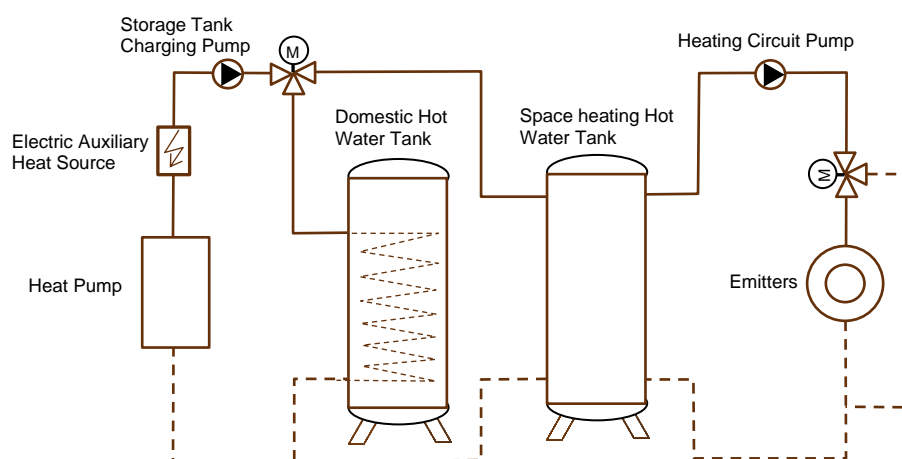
Typical configuration of heat pump systems for a detached house or two-family houses
